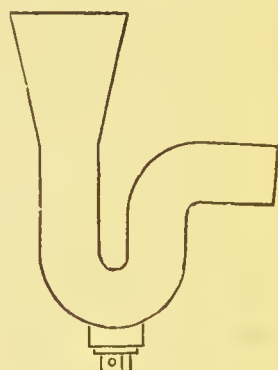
2-in. Half-S trap, with enlarged mouth.
